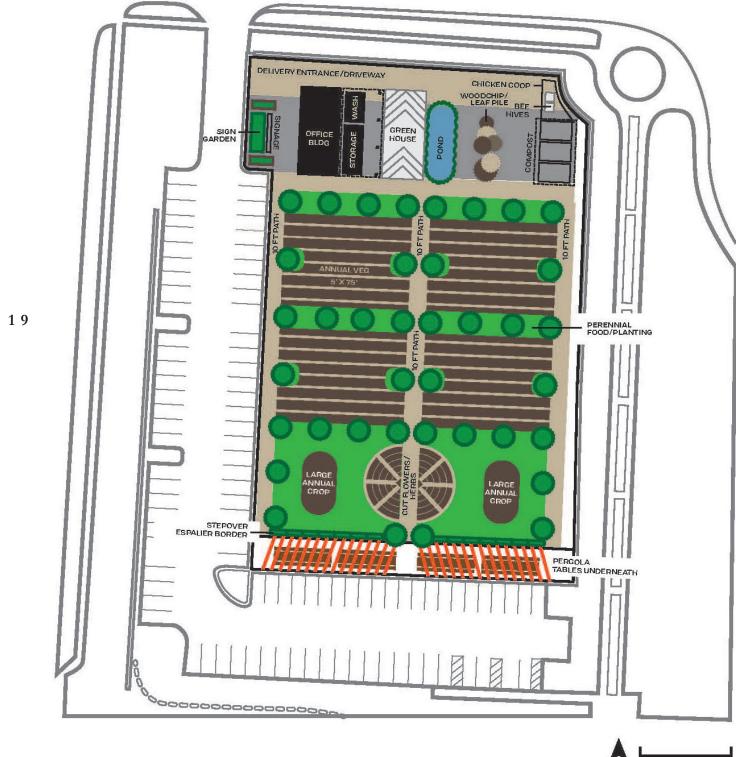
Current working plan for the Westport Commons Farm (Nguyen 2019)
